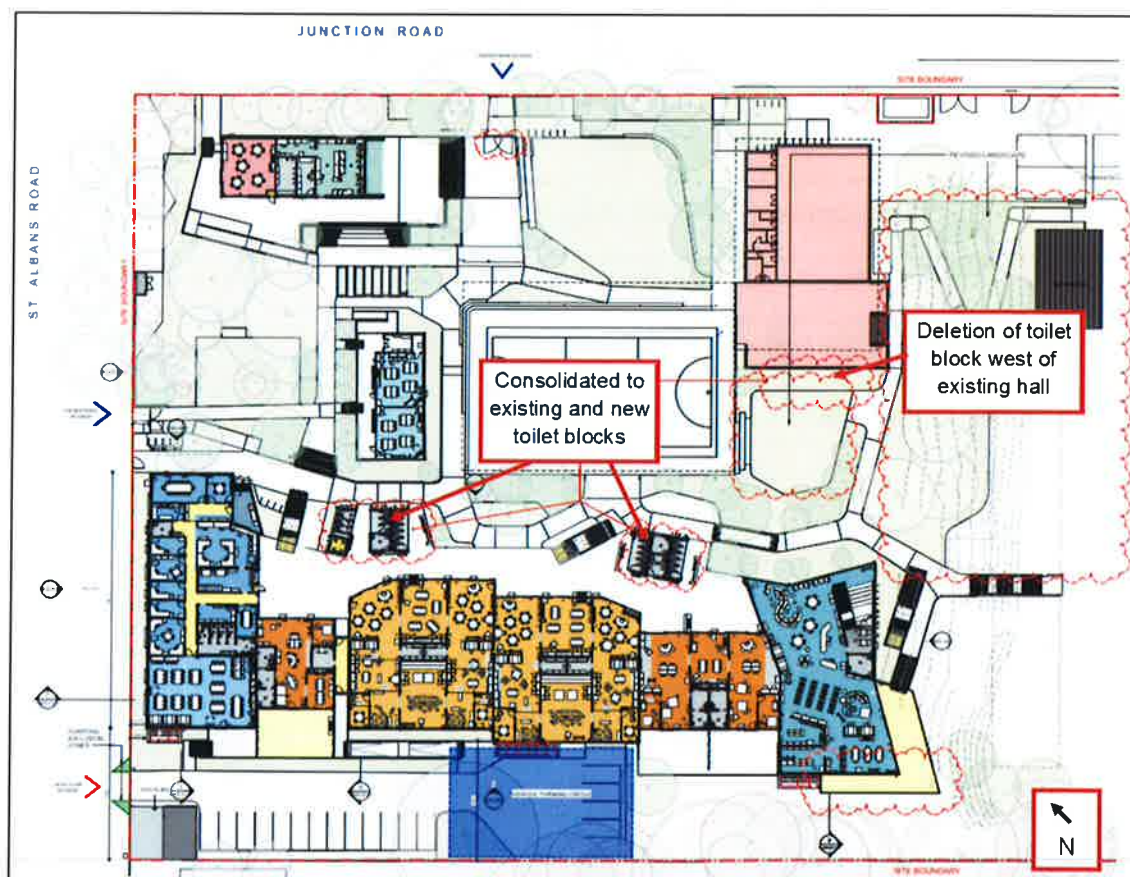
| Proposed Ground Floor Plan (Base source: Applicant's Modification Application 2019)
